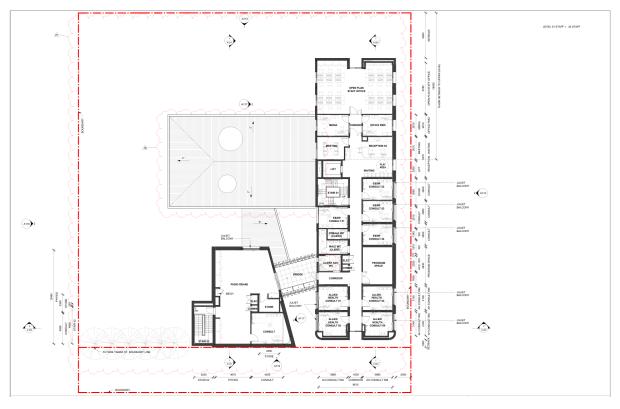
Level 1 Floor Plan. Source: Kaunitz Yeung Architecture
